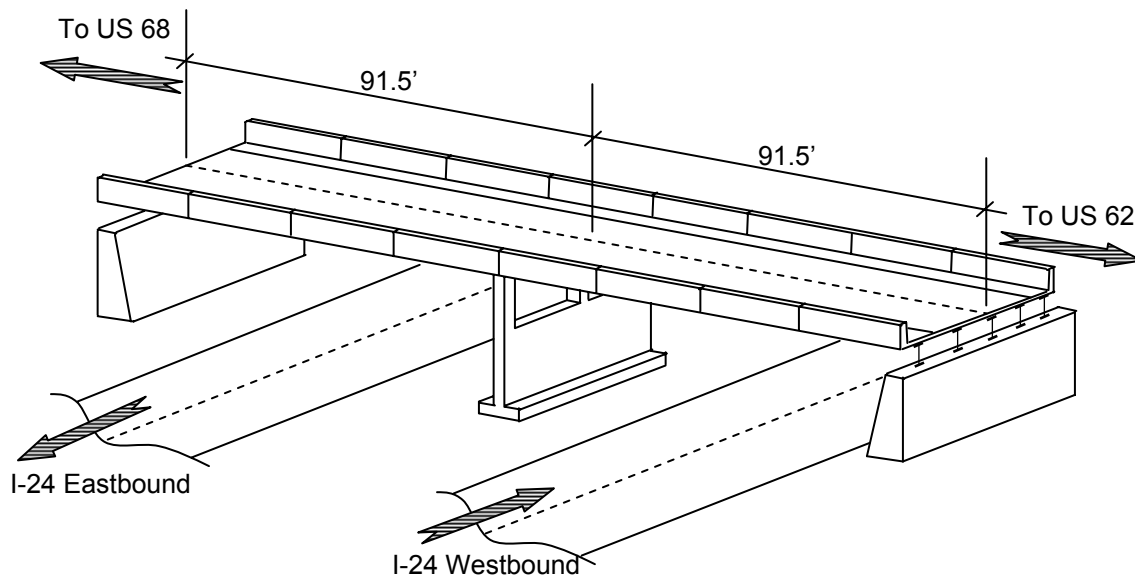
U.S. 68- U.S. 62 Connector Bridge over I-24 in McCracken County in Western Kentucky
